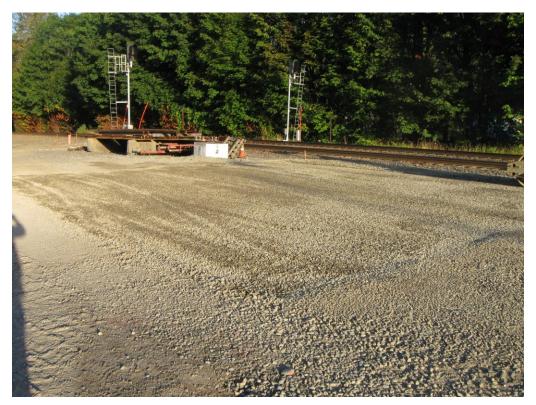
Area A: View from FC-001 looking southeast at final excavation limits.
